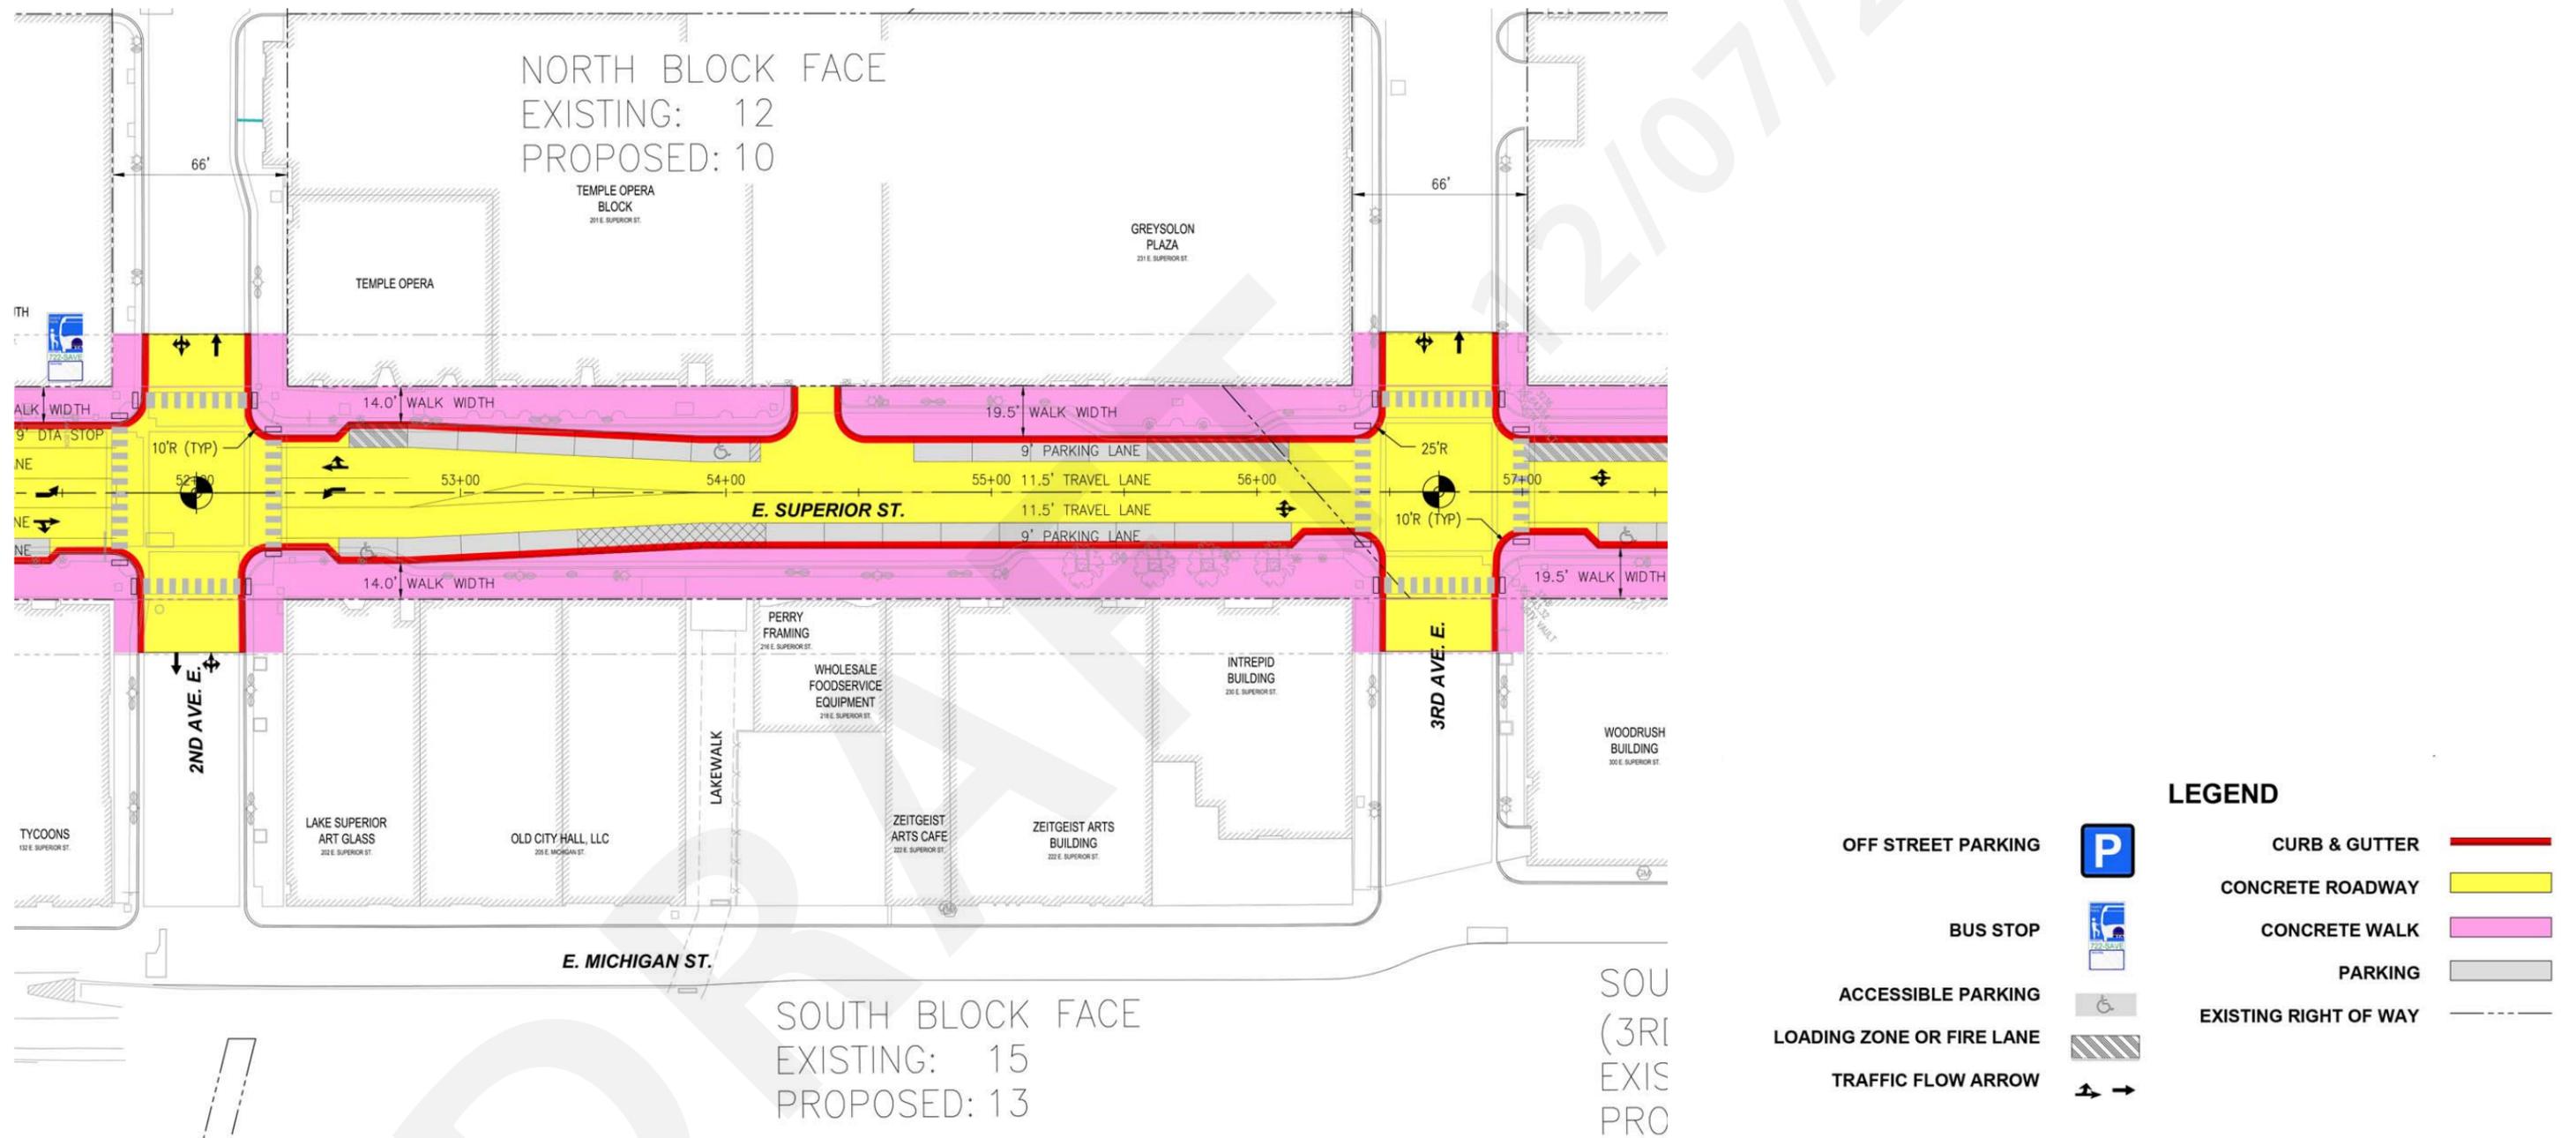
Proposed street layout between 2nd Avenue East and 3rd Avenue East.
